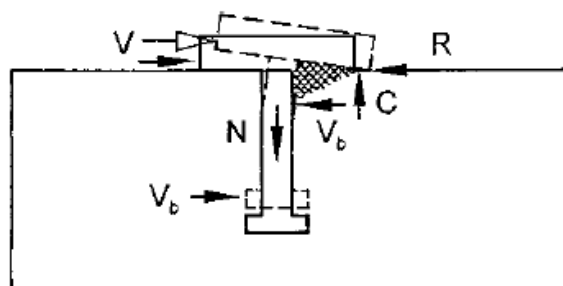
Load bearing mechanism of headed stud in shear (adapted from Eligehausen et al. 2006)
